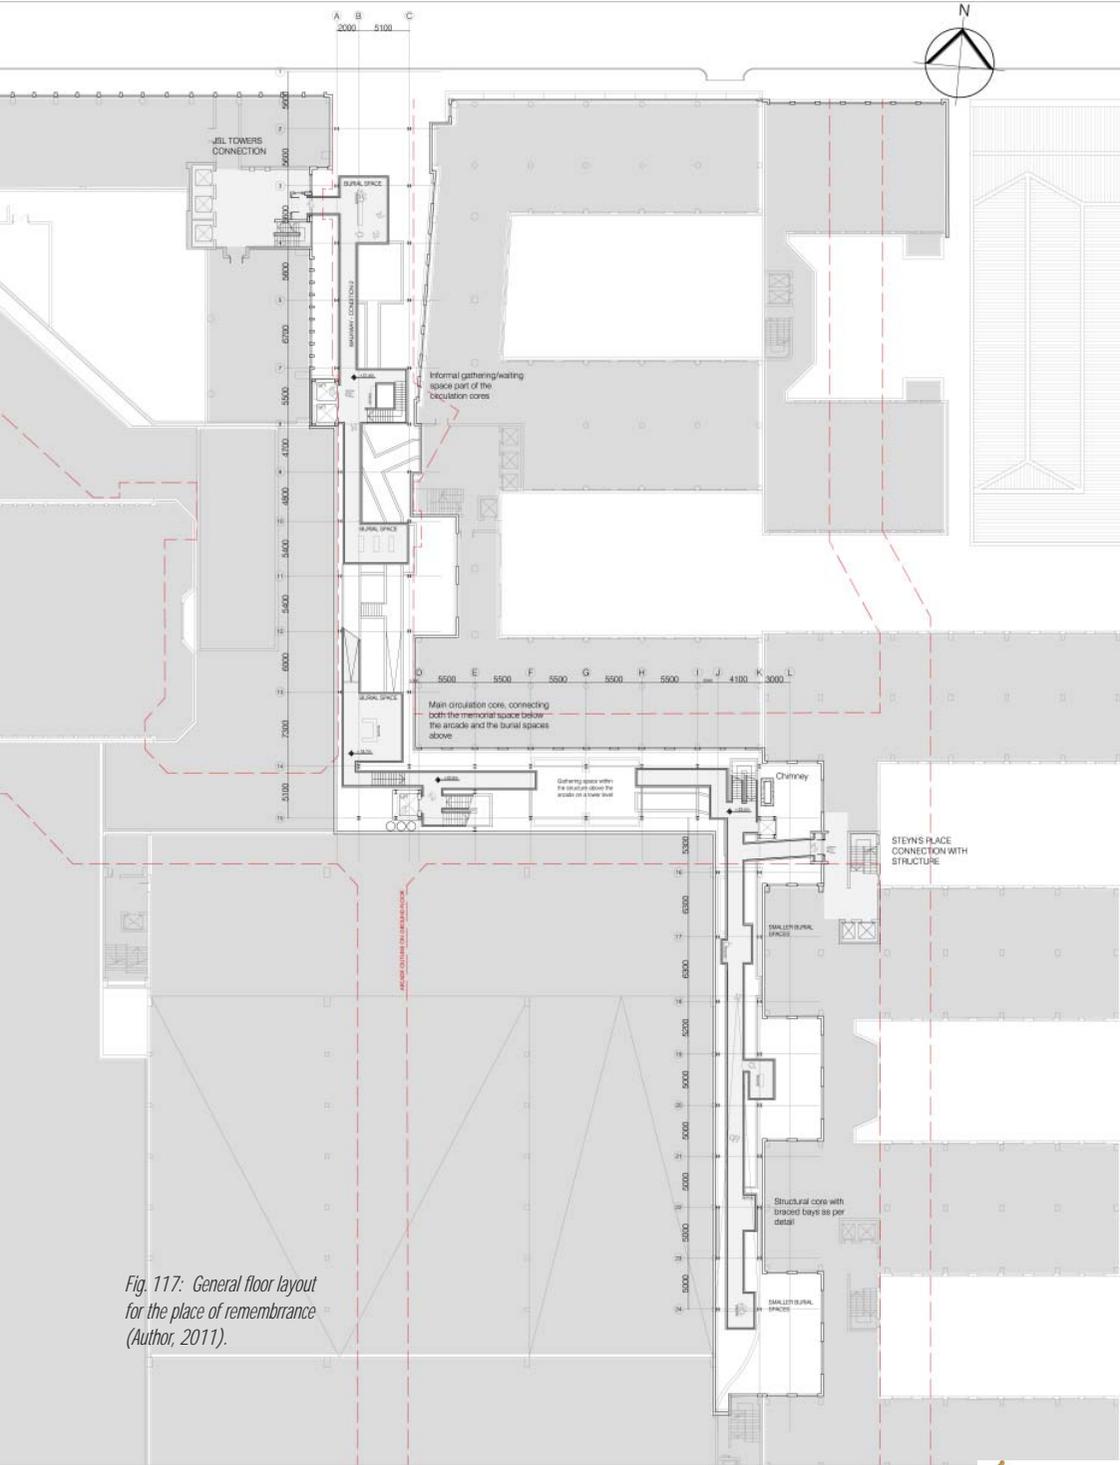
General floor layout for the place of remembrance (Author, 2011).
